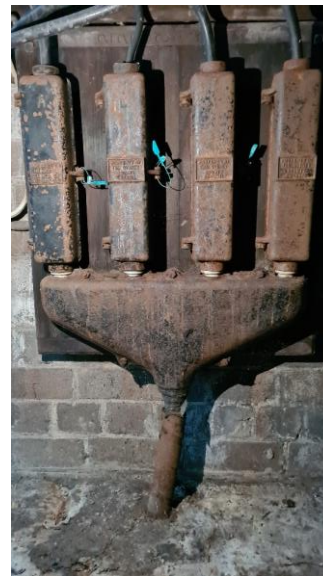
The original electrical conduit box in room A5, pre-1935.
